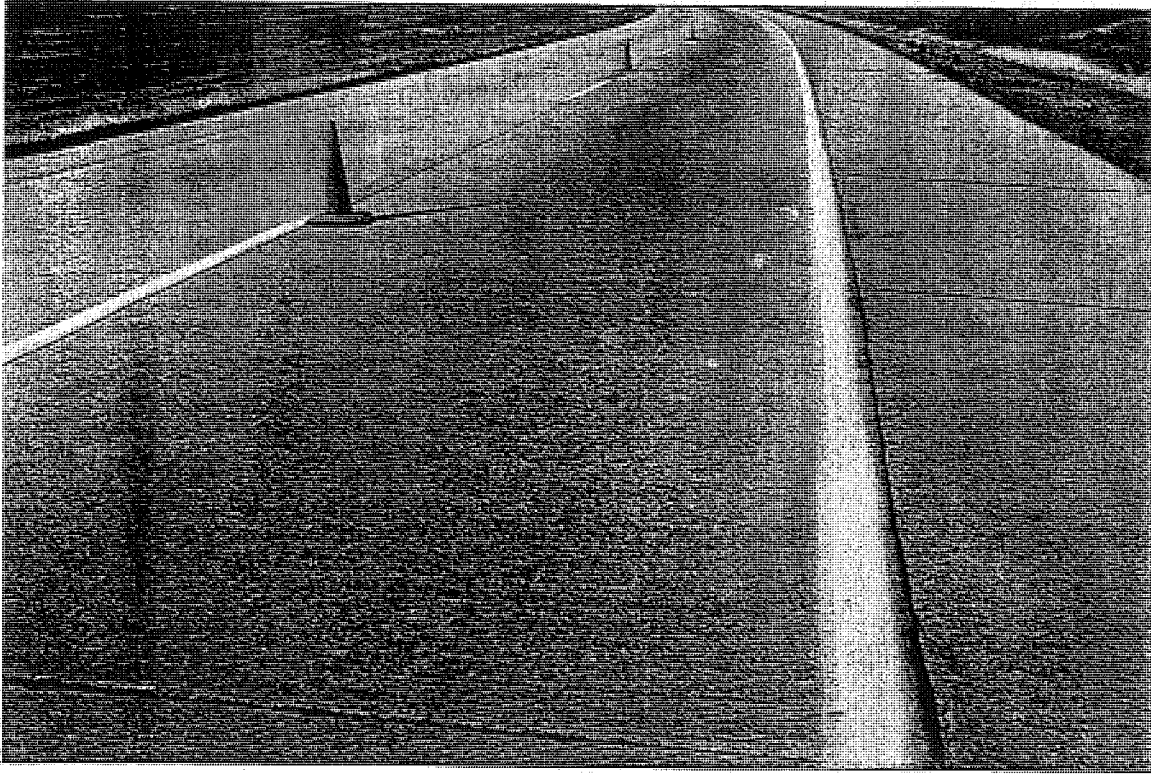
An overview of the end of the test section of CSN# 19043-02234A WB, looking west. This section has 41 ft joint spacings in the driving lanes, but only 14 ft joint spacing in the shoulders.
